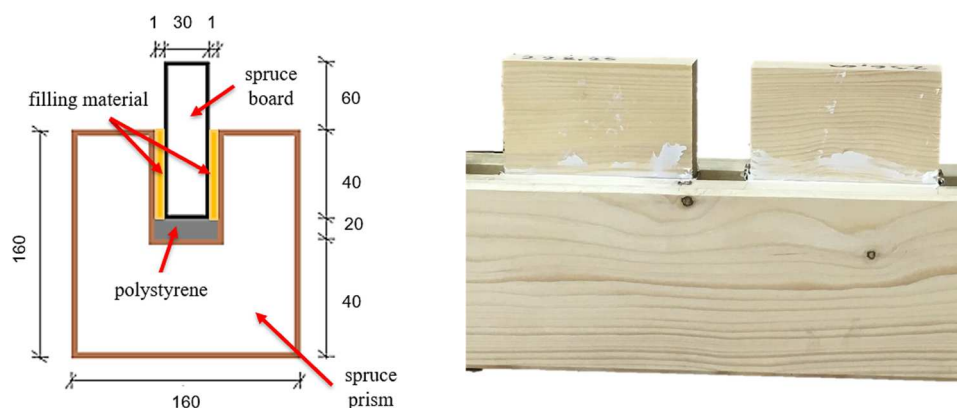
Schematic representation of the dimensions of the test specimen in millimetres (left) and part of the prepared test specimens before formatting to the required dimensions (right).
